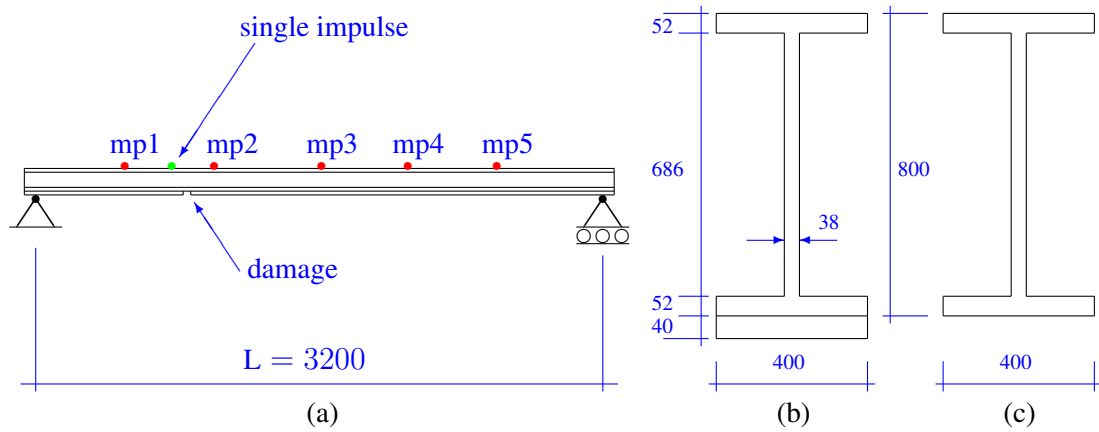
(a) Simple supported steel beam model, (b) Non-damaged section, (c) Damaged section.
